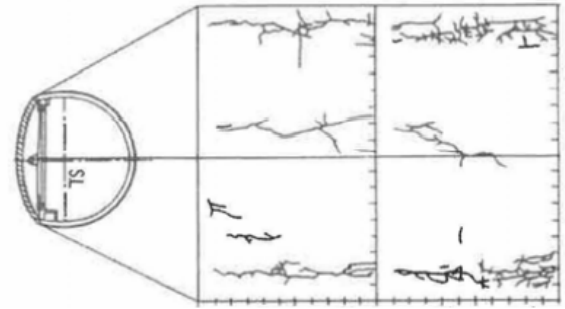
Ureshino tunnel (Crack of concrete lining)
